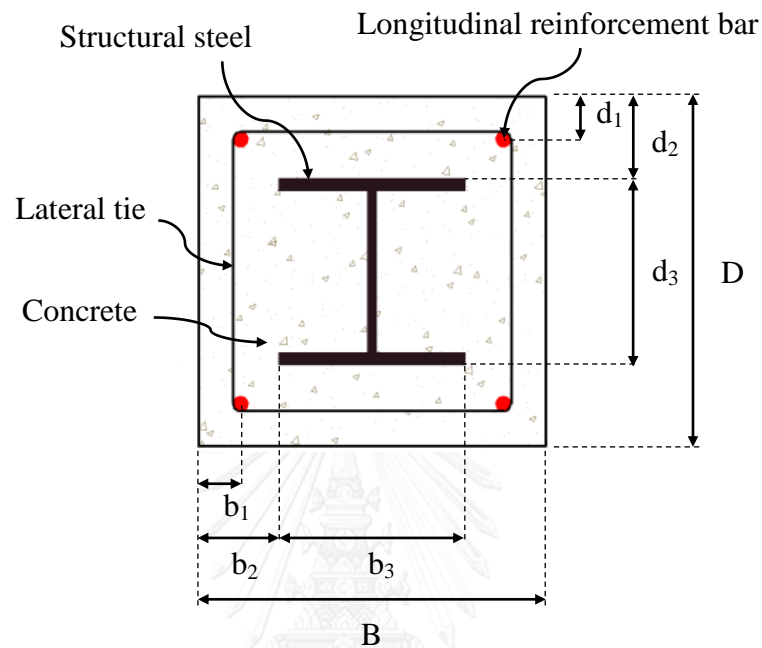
Cross-section configurations of concrete encased steel beam-columns.
